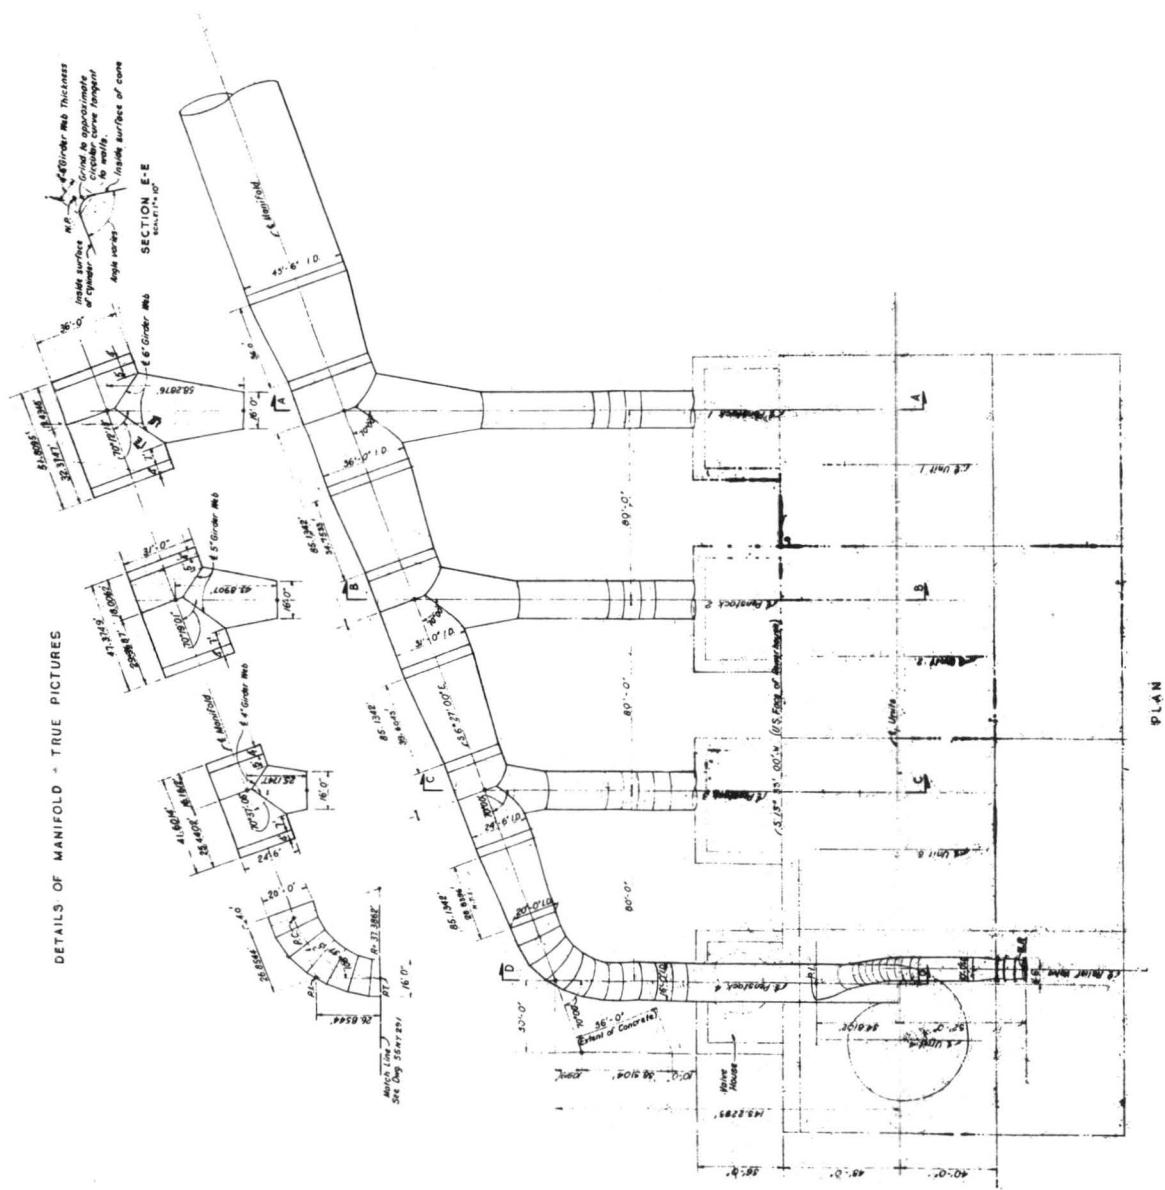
DETAILS OF THE PROTOTYPE MANIFOLD
